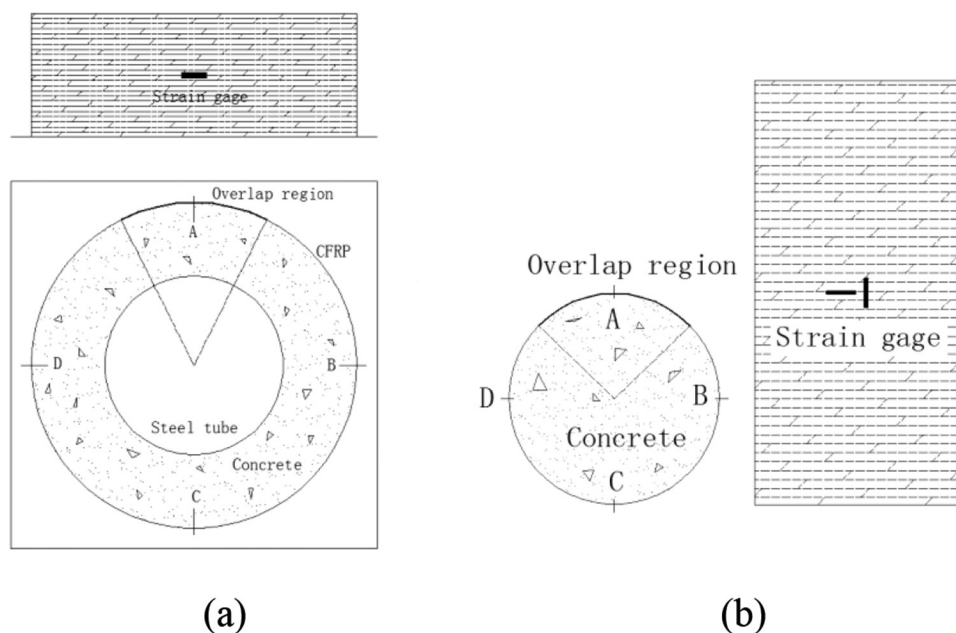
Layout of strain gauge for: (a) disc specimen; and (b) column specimen.
